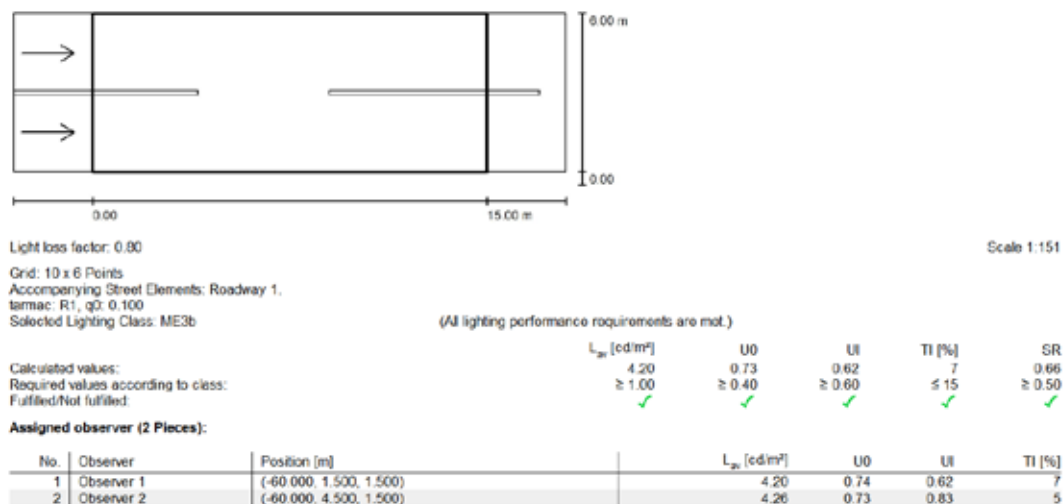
Reference street lighting calculation – Hrvatskih Branitelja street – segment 2
